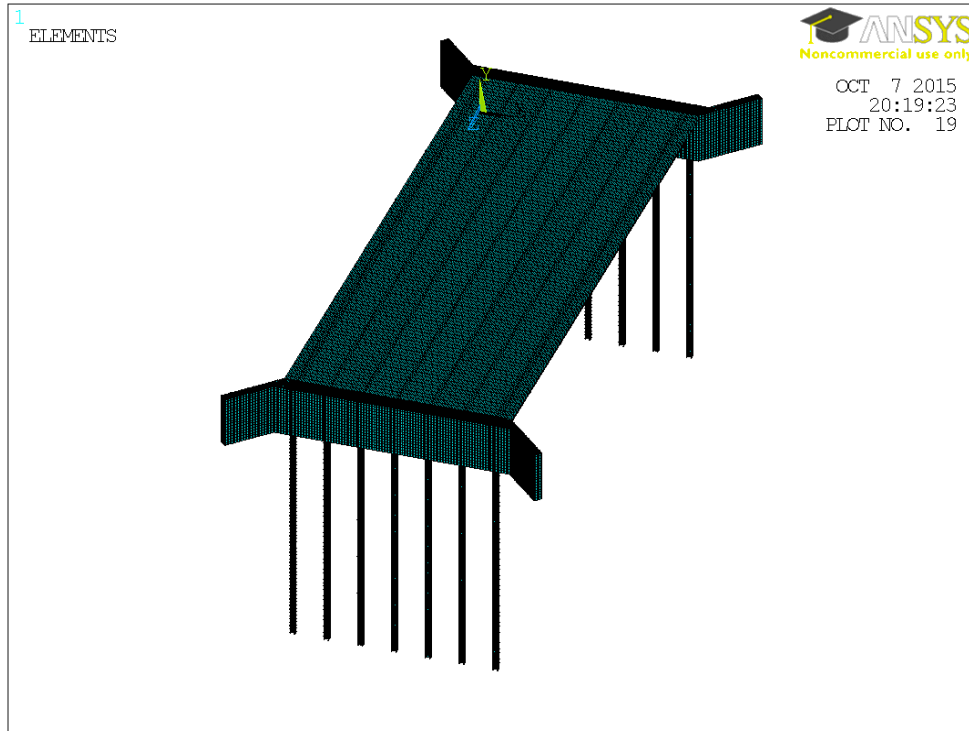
Finite element model of an integral abutment bridge with flared cantilever wingwalls at 45 degrees
